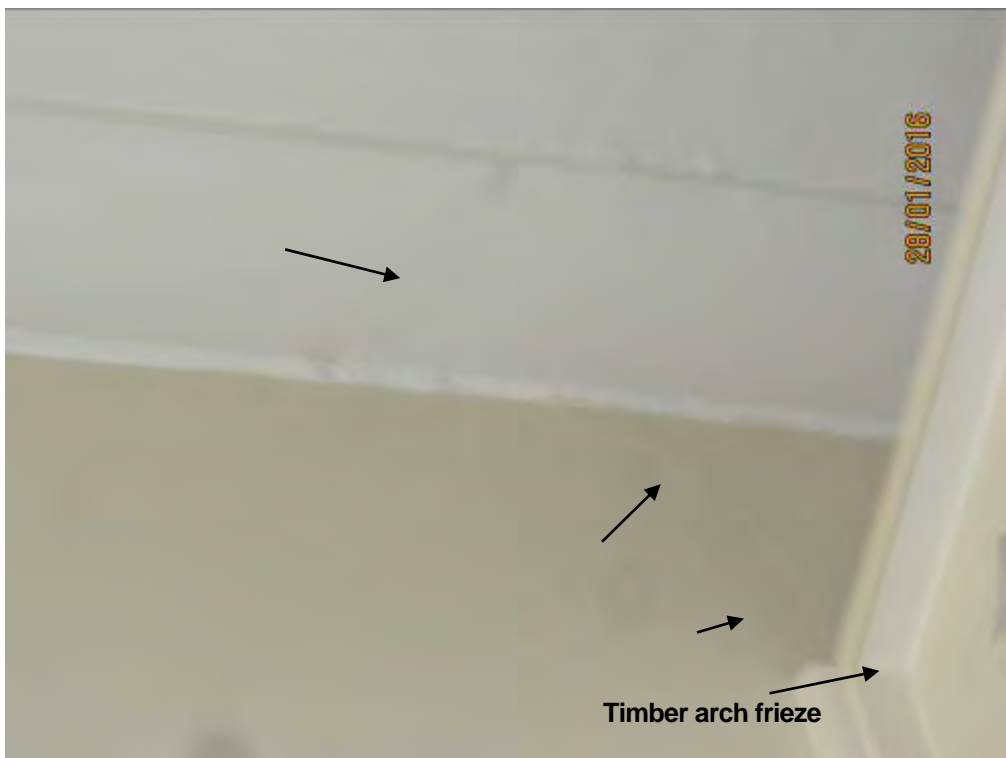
shows a hairline crack to the set joint in the ceiling of the Hallway
